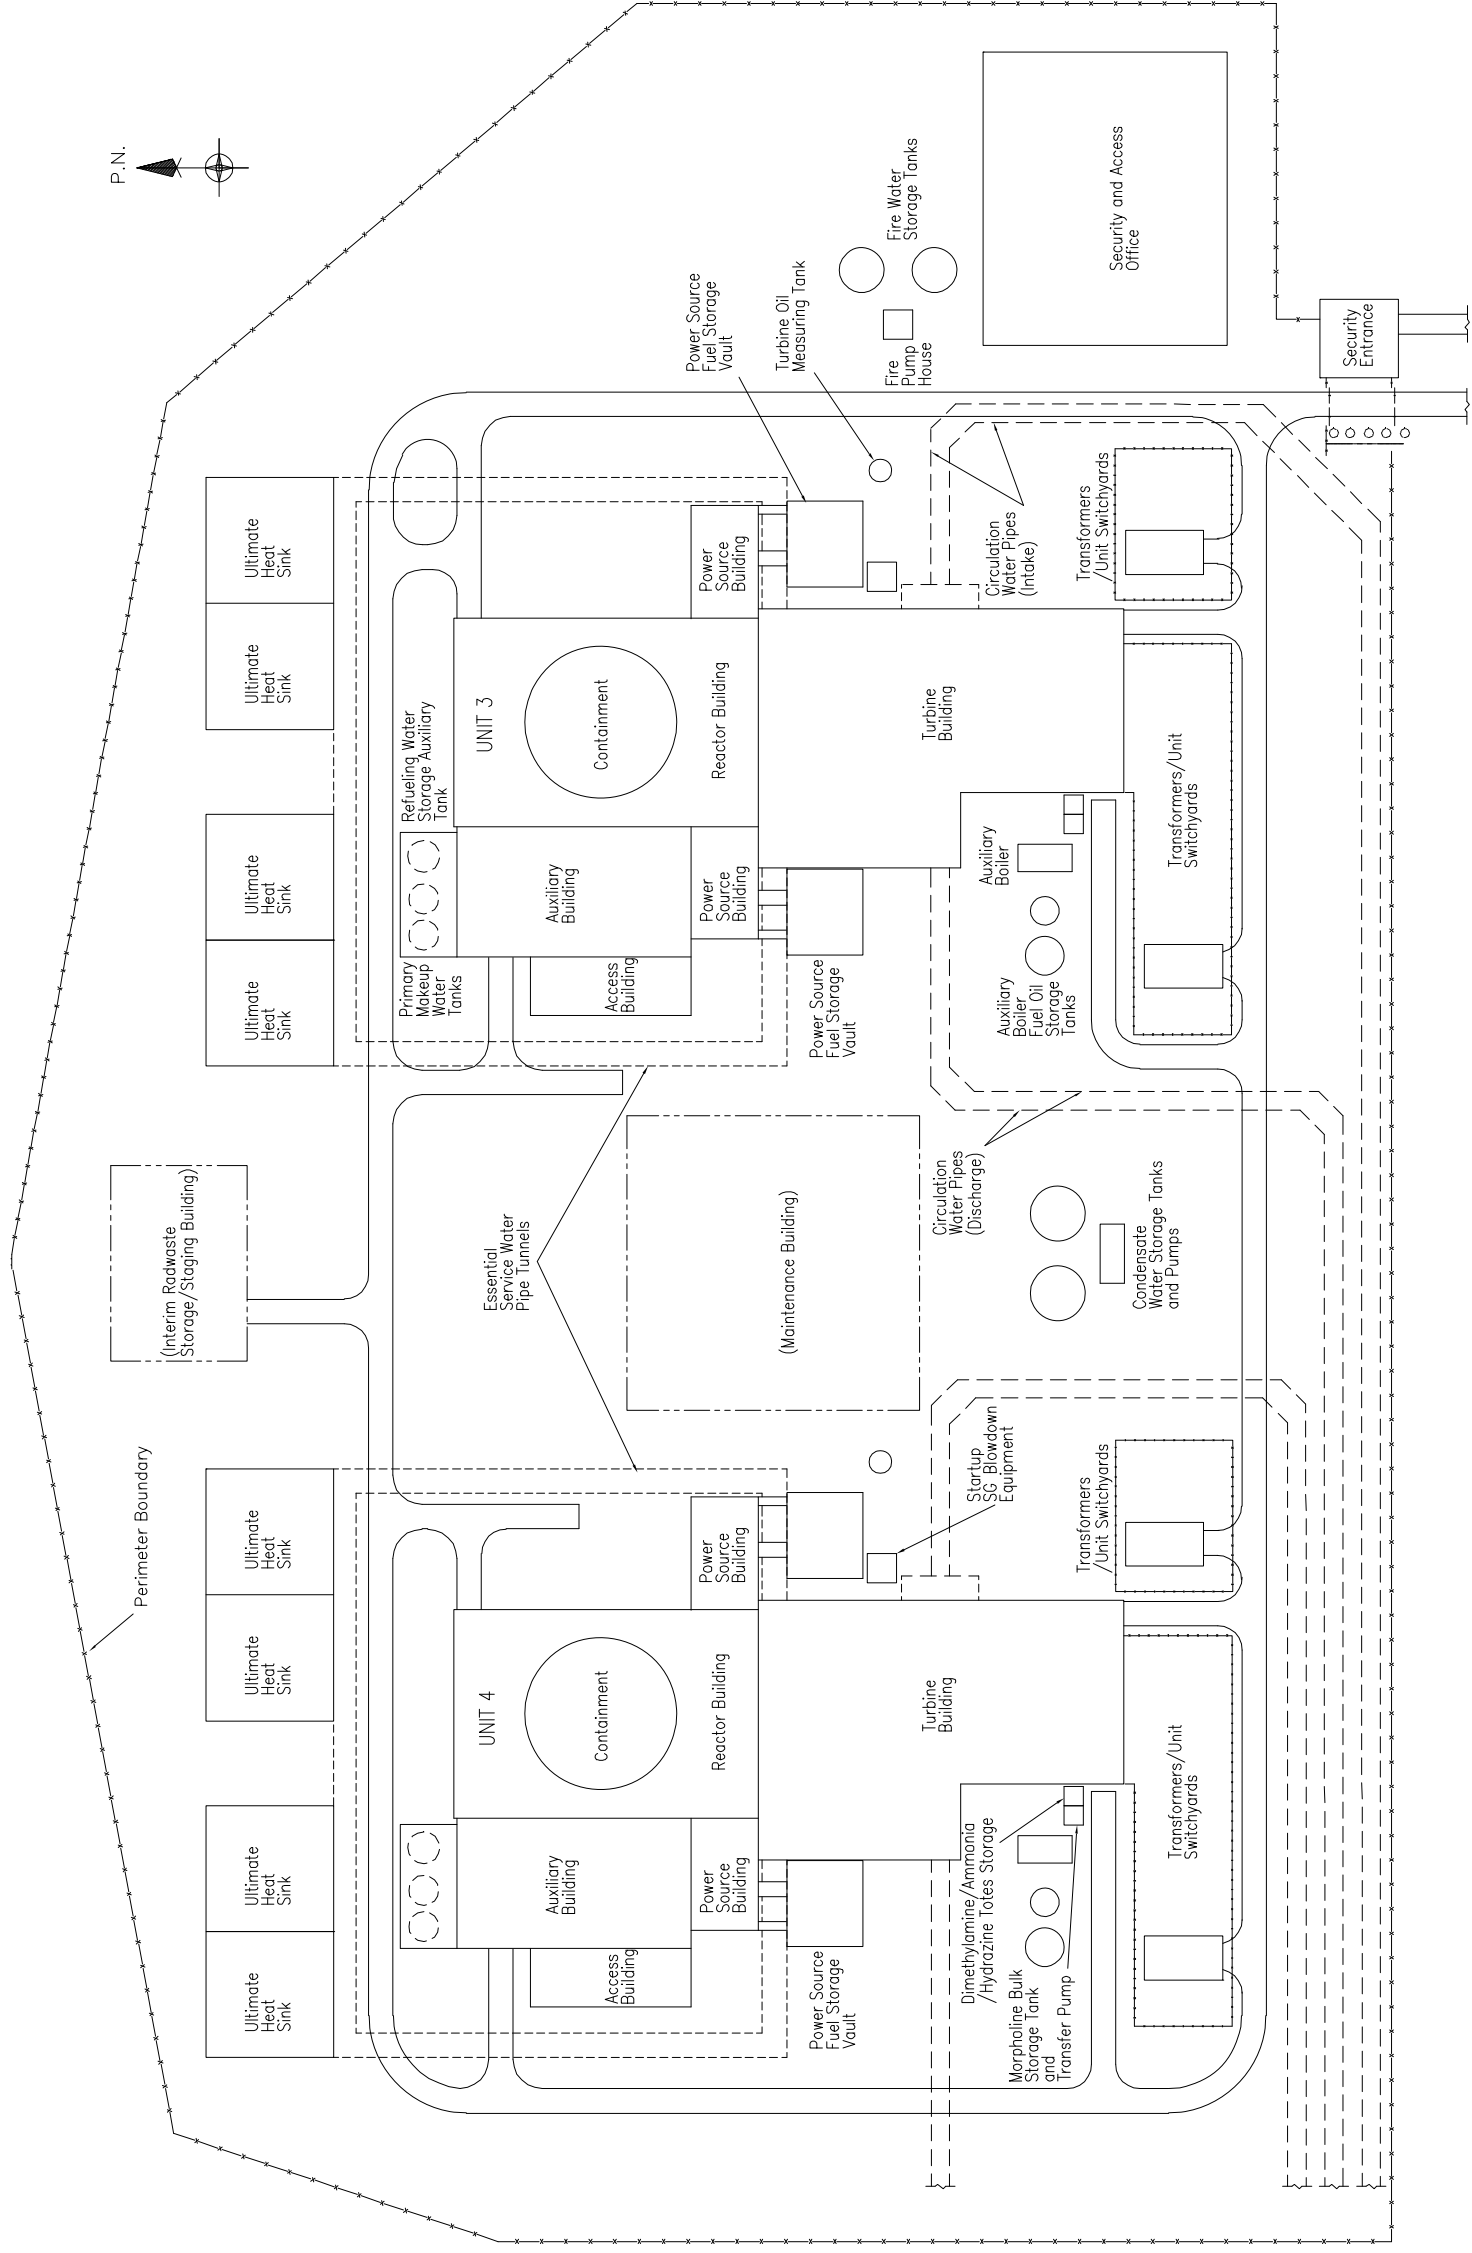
R Comanche Peak Units 3 & 4 Site Plan (Sheet 2 of 2)
